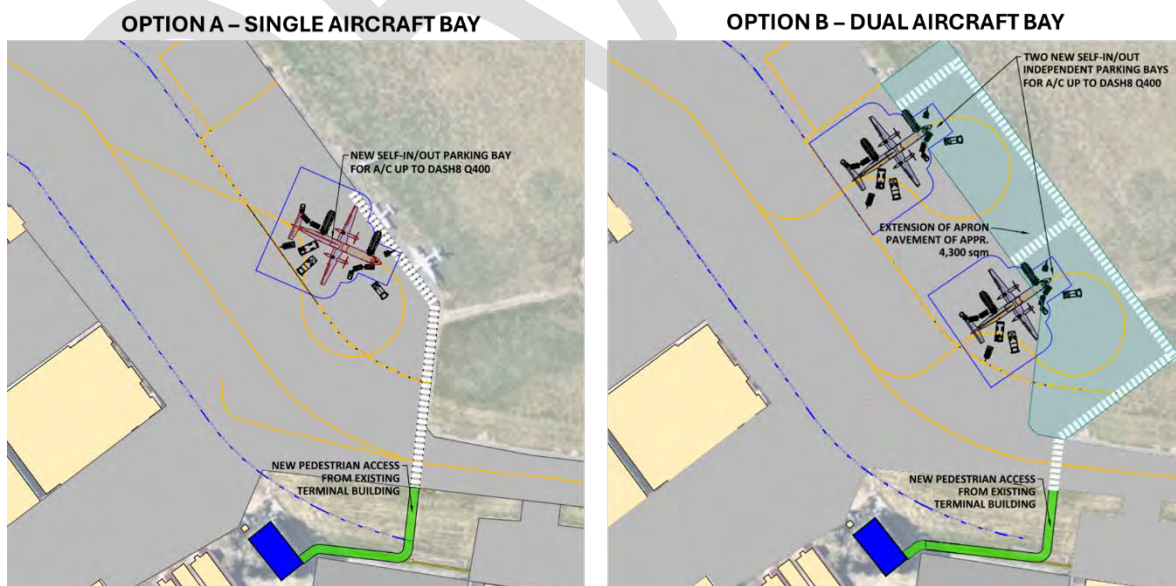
Existing Apron Area Redesign Concept Plan, Option A (left) and Option B (right)
